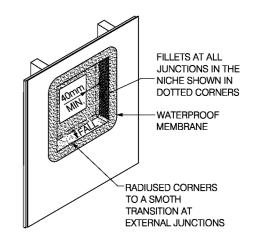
NICHE IN SHOWER WALL FRAMEWORK
